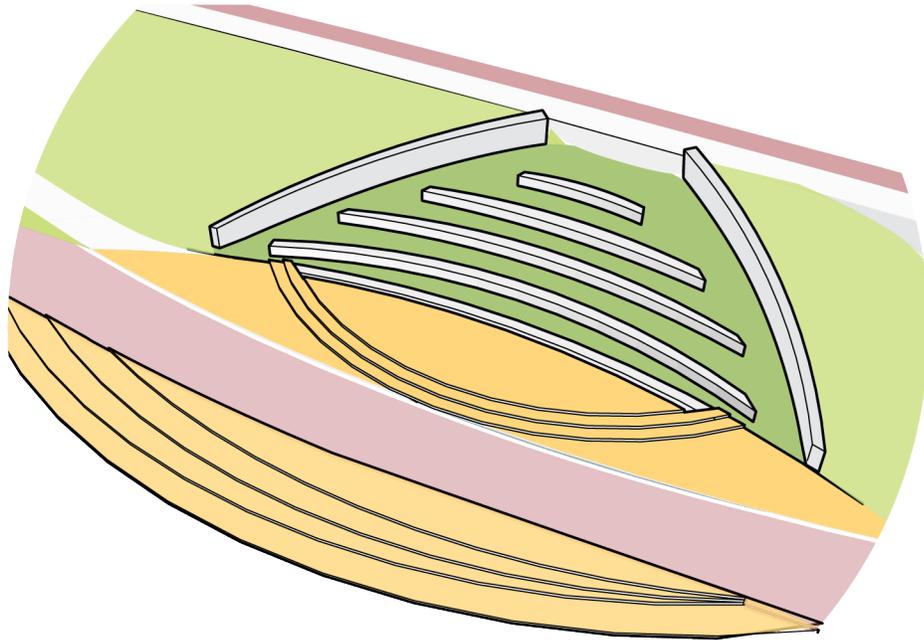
100-300 block Fallsway plan (site 1- “The Meander” )
